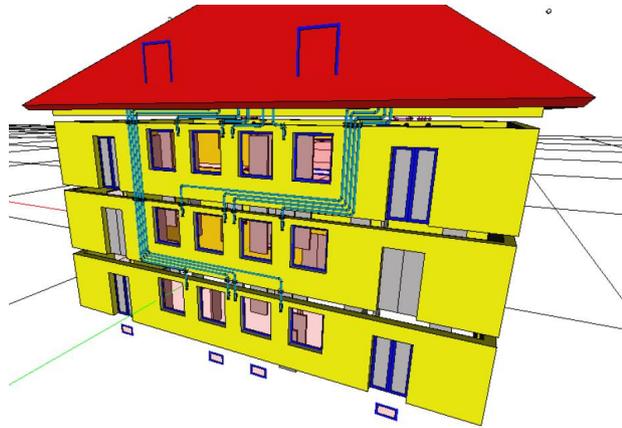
sketch of one of the case studies installing the supply and extract air ducts in the exterior wall insulation. Source: (Music 2018).
